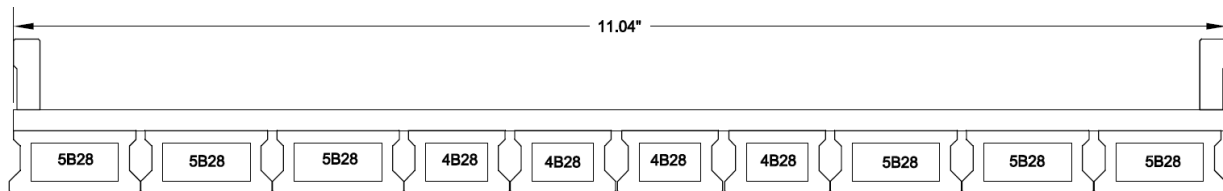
Bridge Model 4: 46' wide deck with six 5BB-28 and four 4BB-28 box beams
